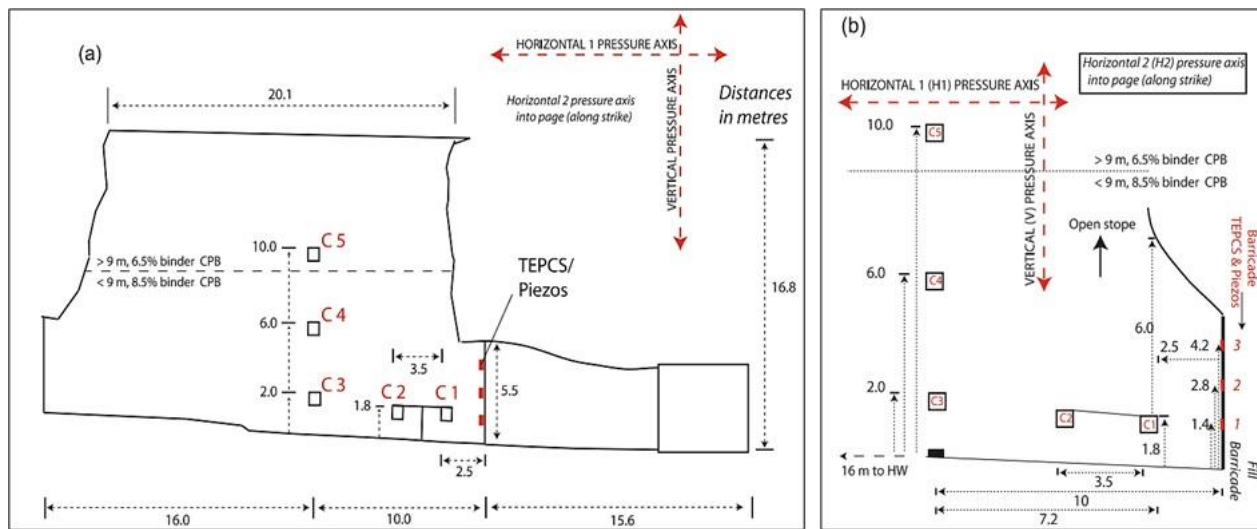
a) Cross-section showing instrument locations in the 685-stope, b) Detailed instrument plan-cross-section of the 685-stope (from Thompson et al., 2012).
